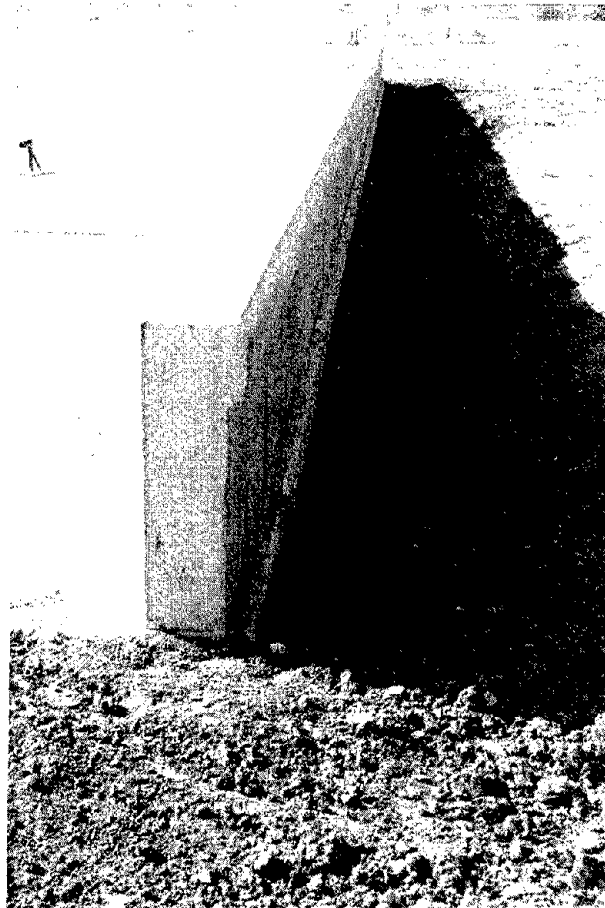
32-in (813-mm) concrete parapet before test 7069-5.
